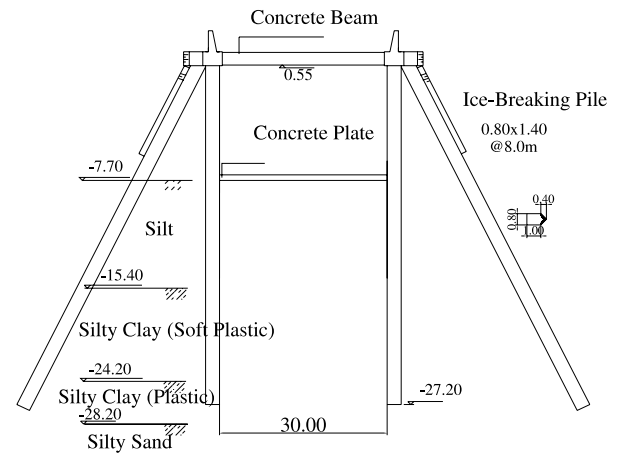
Typical cross section of the sheet pile and geological layers at the site (Unit: m).
